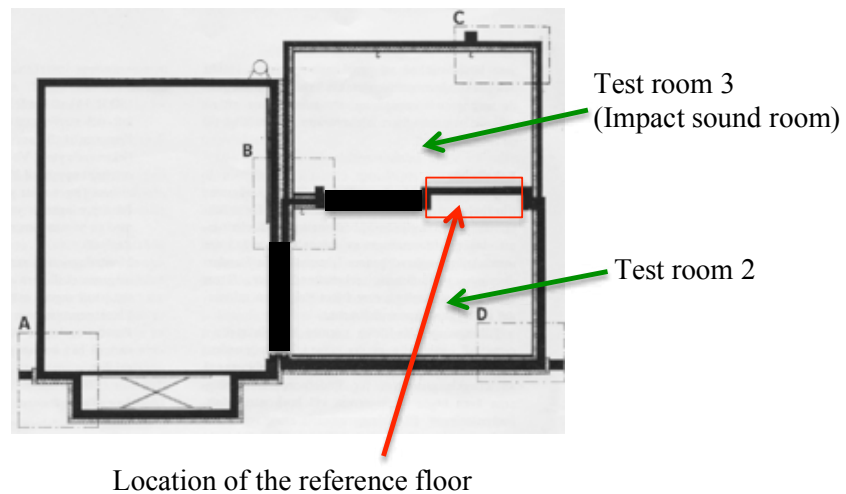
Section for Test room 2 and Test room 3 together with the location of the reference floor.
